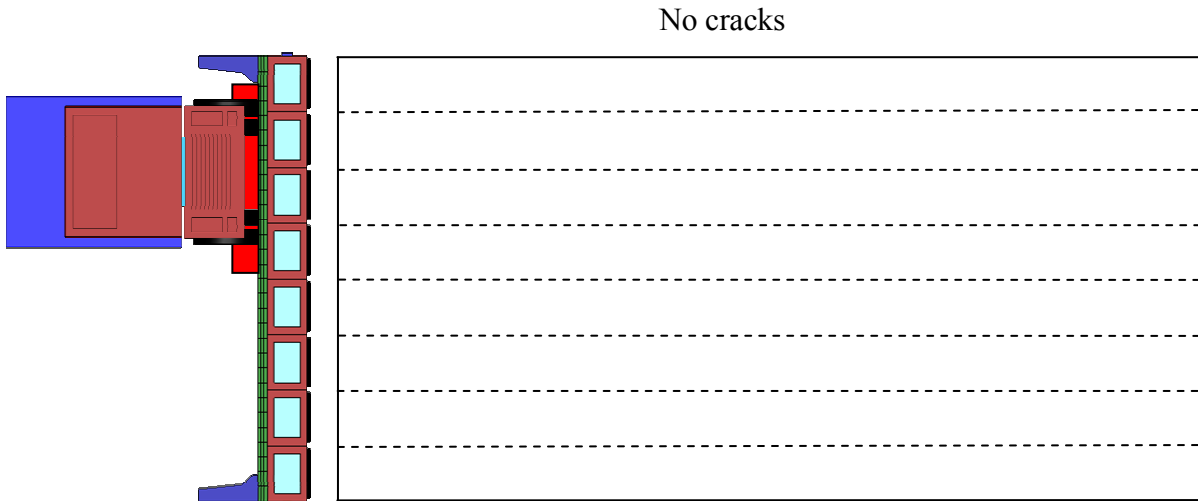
Crack development in the slab bottom surface after applying AASHTO HL-93 load.
